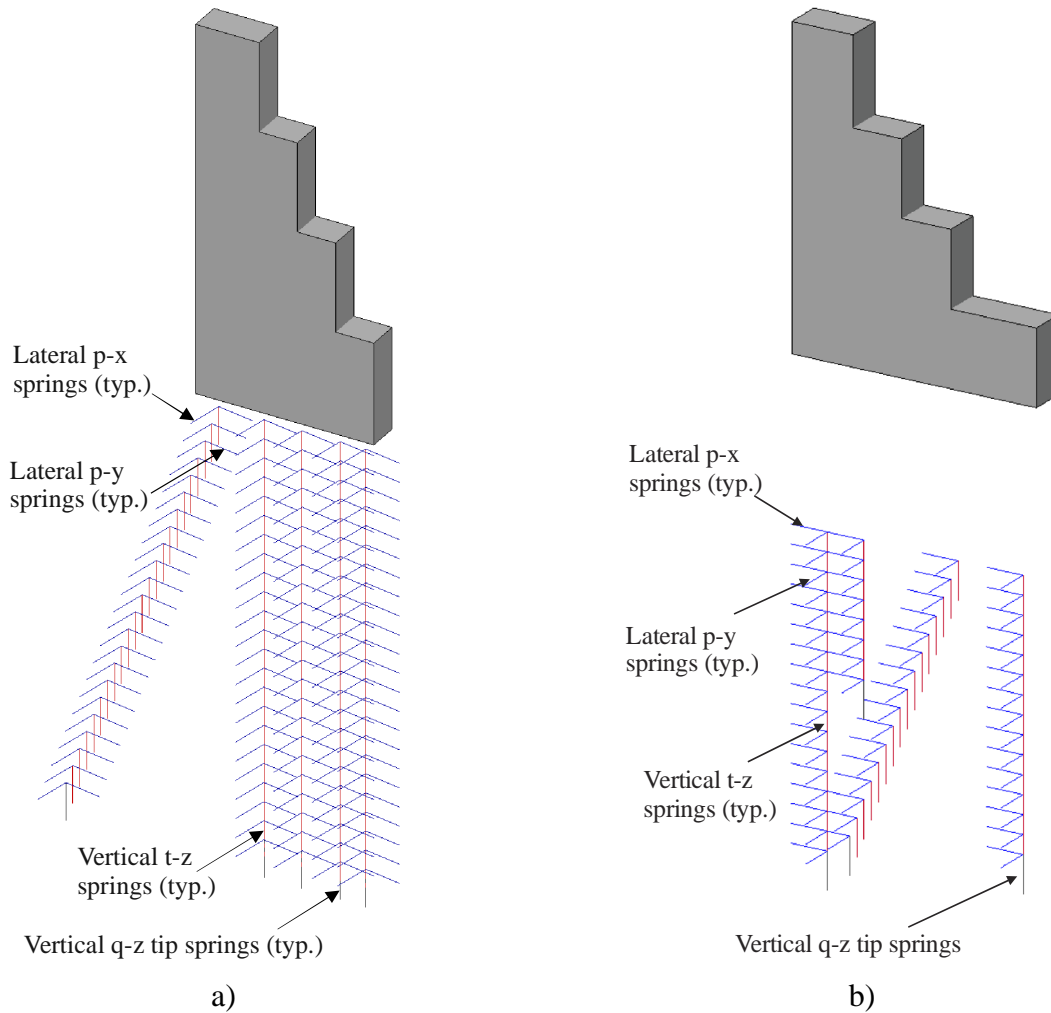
Longitudinal slices of pile founded guide wall models with soils springs included: a) MRLD2 finite element model; b) MRLD3 finite element model (rock crib extending between bottom of wall and soil surface not shown)
